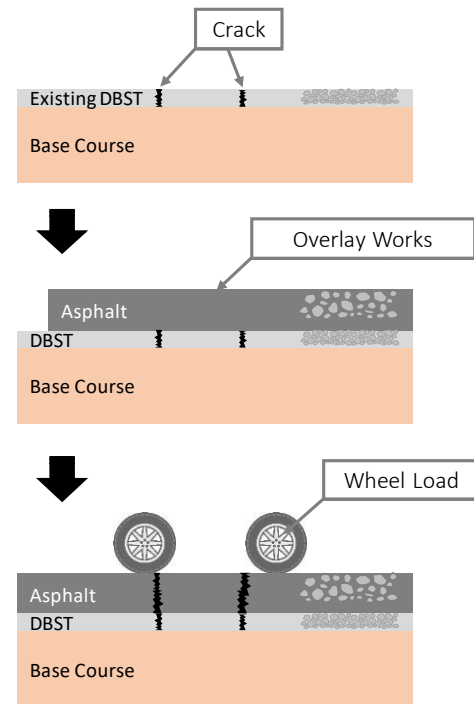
Cracking Mechanism of Asphalt Overlay
